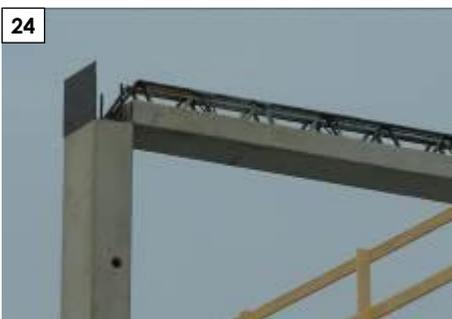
, 21, 22, 23, 24, 25 –beams laying on wet structural joint prefabricated columns without shelves
